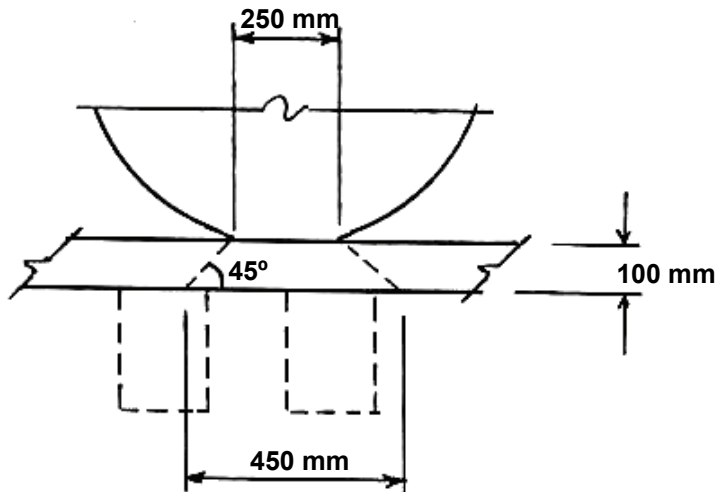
Distribution of wheel load through planking obtained by 45° distribution
